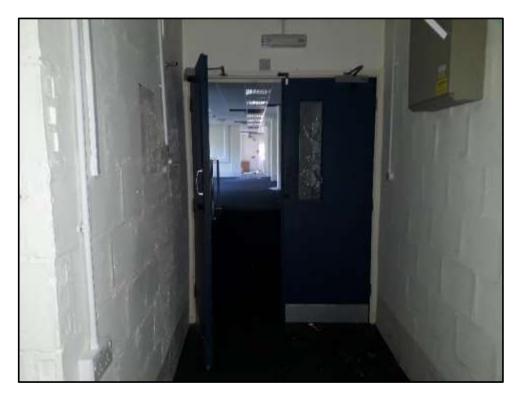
D Block, looking north into spur 8 from the corridor, not brick structural columns within main space beyond the doors and the brick tile internal walls
